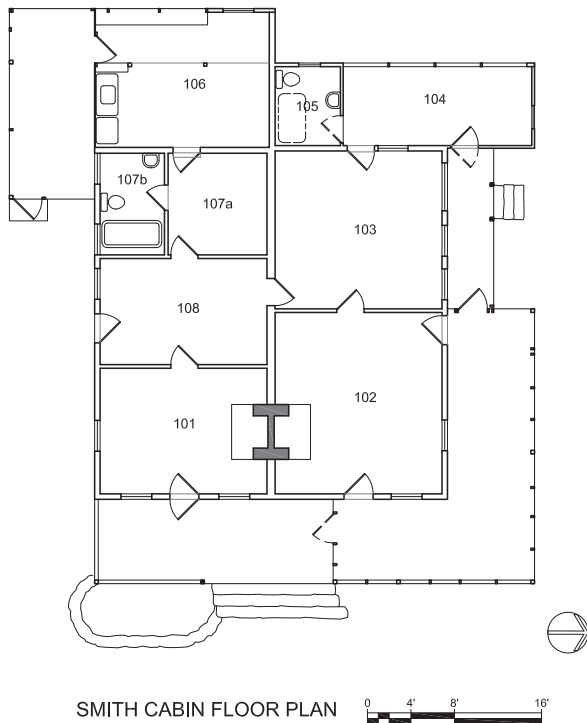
Floor plan showing alterations to back porch. Ledger size plan is in the Appendix.
